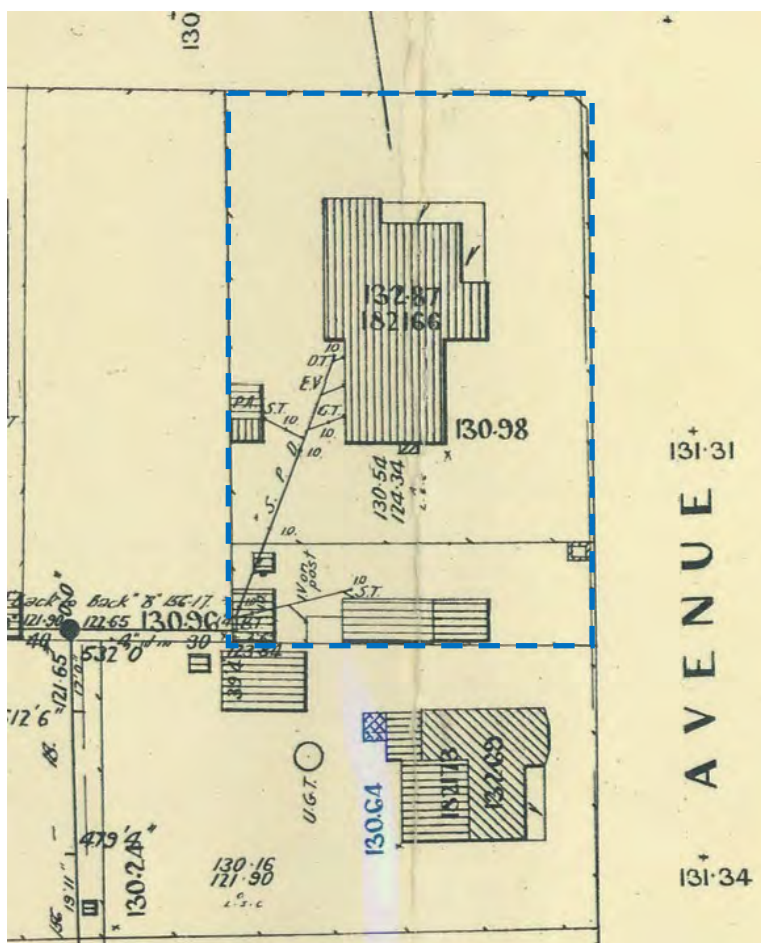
1930 plan of the subject site, with a footprint of the early house and outbuildings (Source: MMBW DP 3211, dated 1930)
